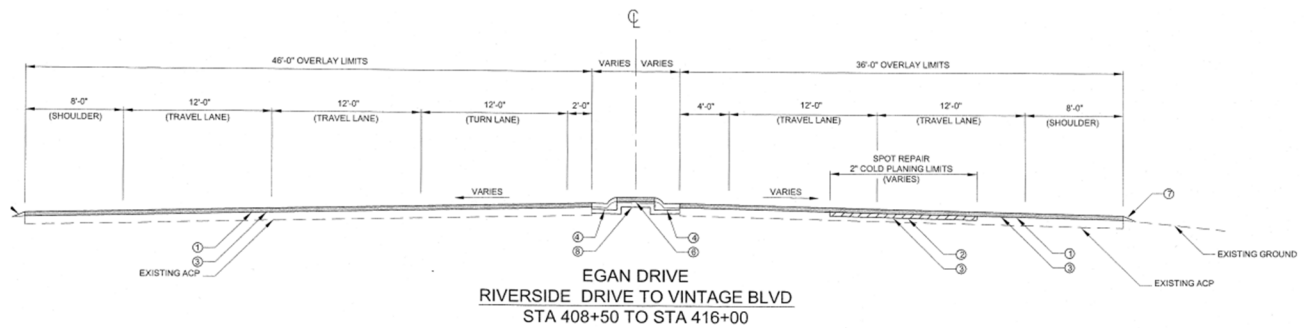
Typical Section – Egan Drive from Riverside Drive to Vintage Boulevard
